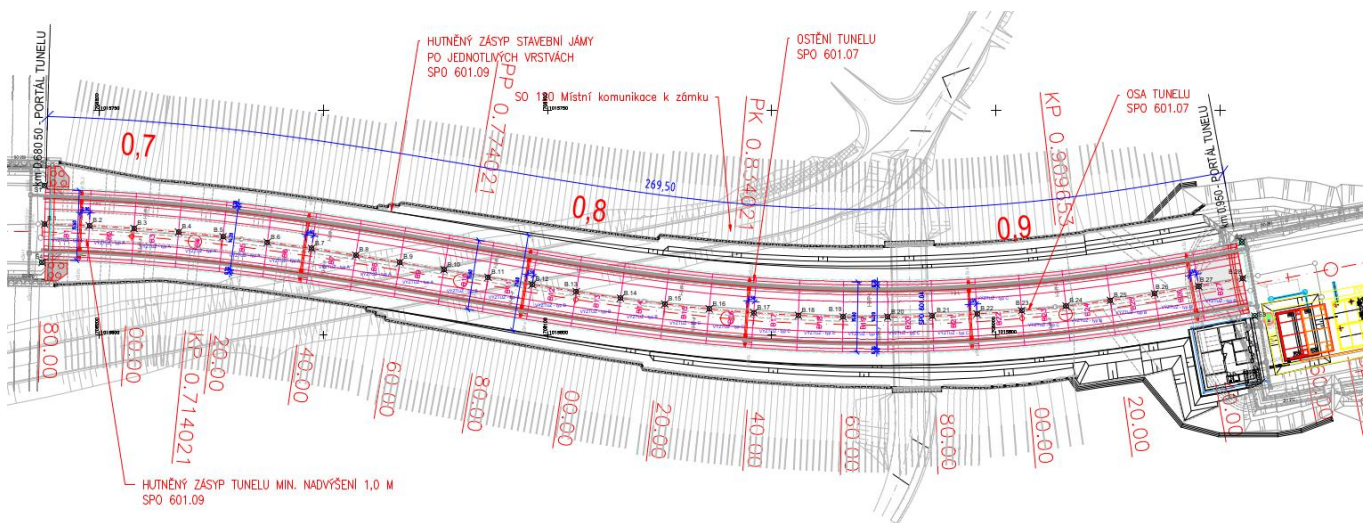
Tunnel layout (Amberg Engineering Slovakia, s.r.o. 2015)
